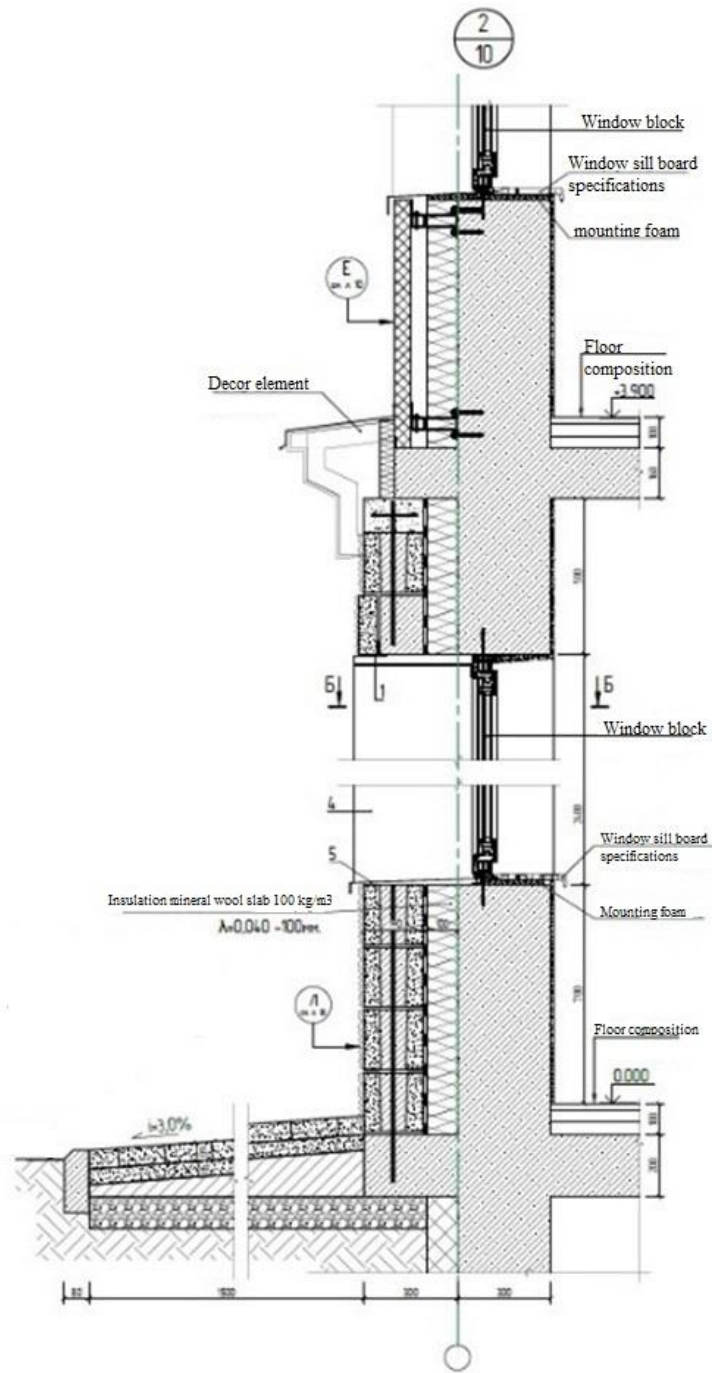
Vertical section of the window–wall junction showing the interface between the window block and the external wall, including insulation and sealing components (author’s materials)
